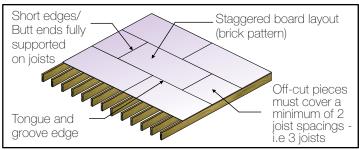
BOARD LAYOUT - STAGGERED PATTERN
